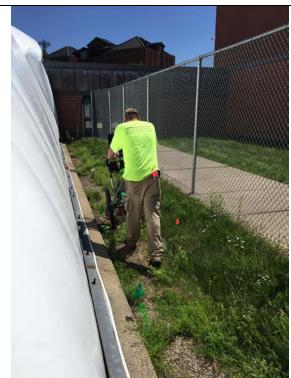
Underground Surveying performing underground utility mark-out near proposed location for SB-8. Sanitary sewer line located just north of the proposed boring
